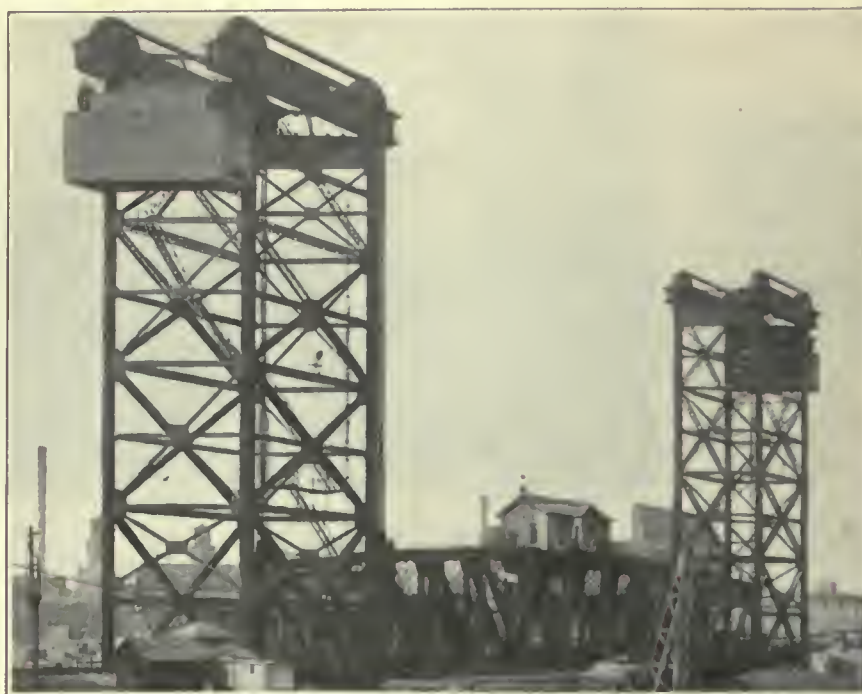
BRIDGES. Lift bridge of the Chicago & Alton Railroad and the Pittsburgh, Fort Wayne & Chicago Railway, across the Chicago River at 20th Street and Stewart Avenue.
